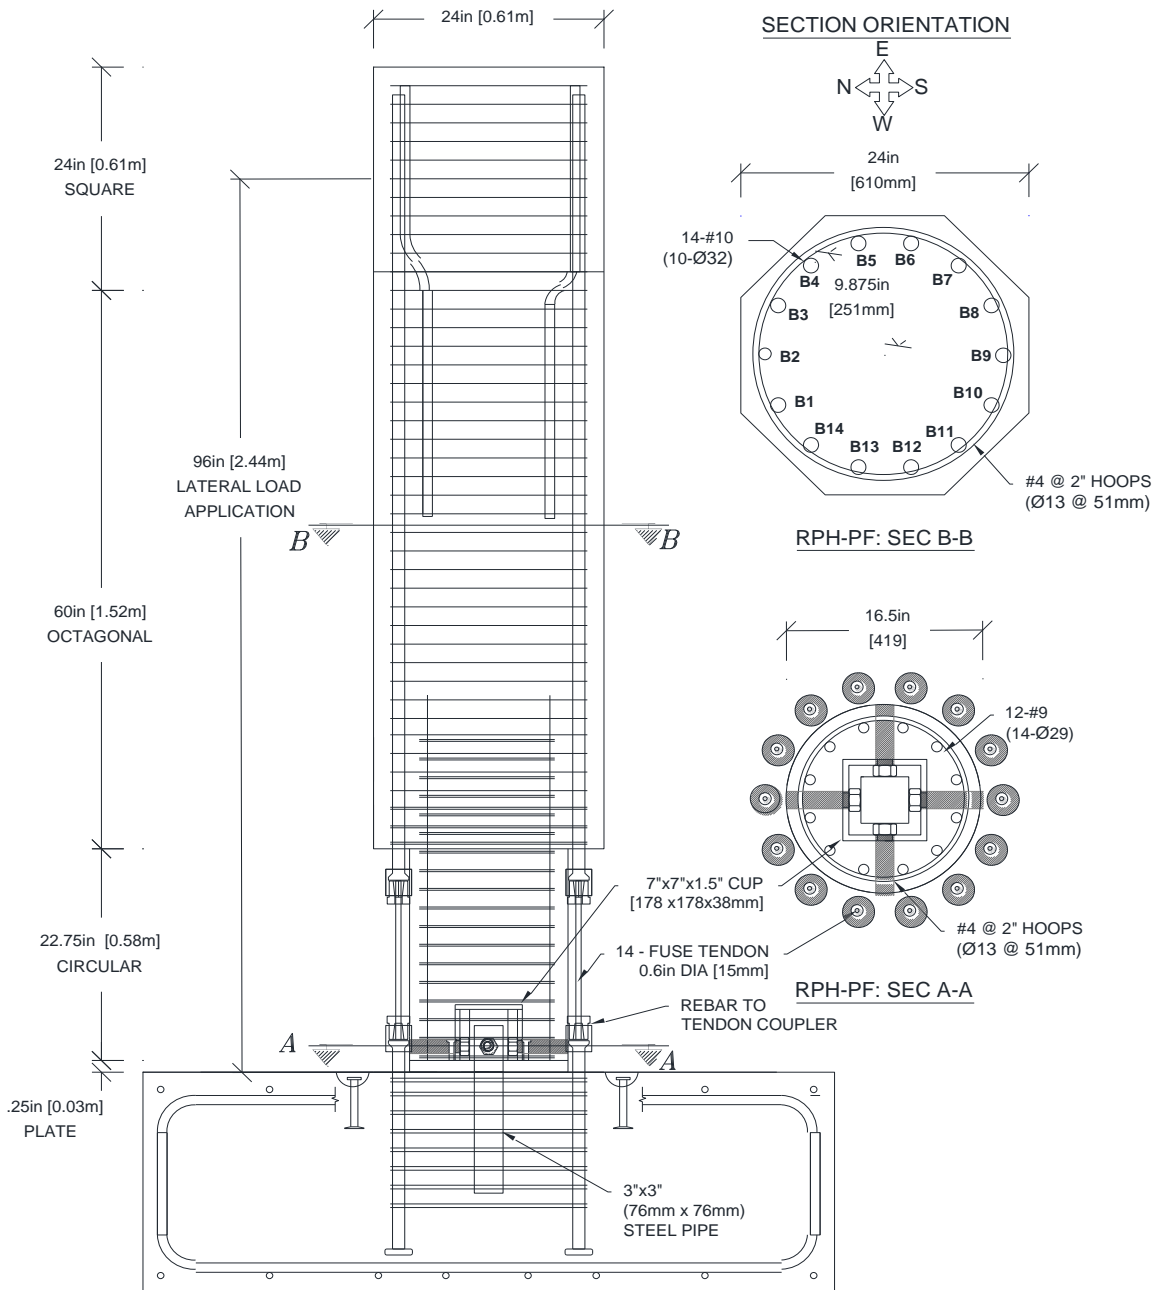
Reinforcement Detailing of RPH-PF Column
